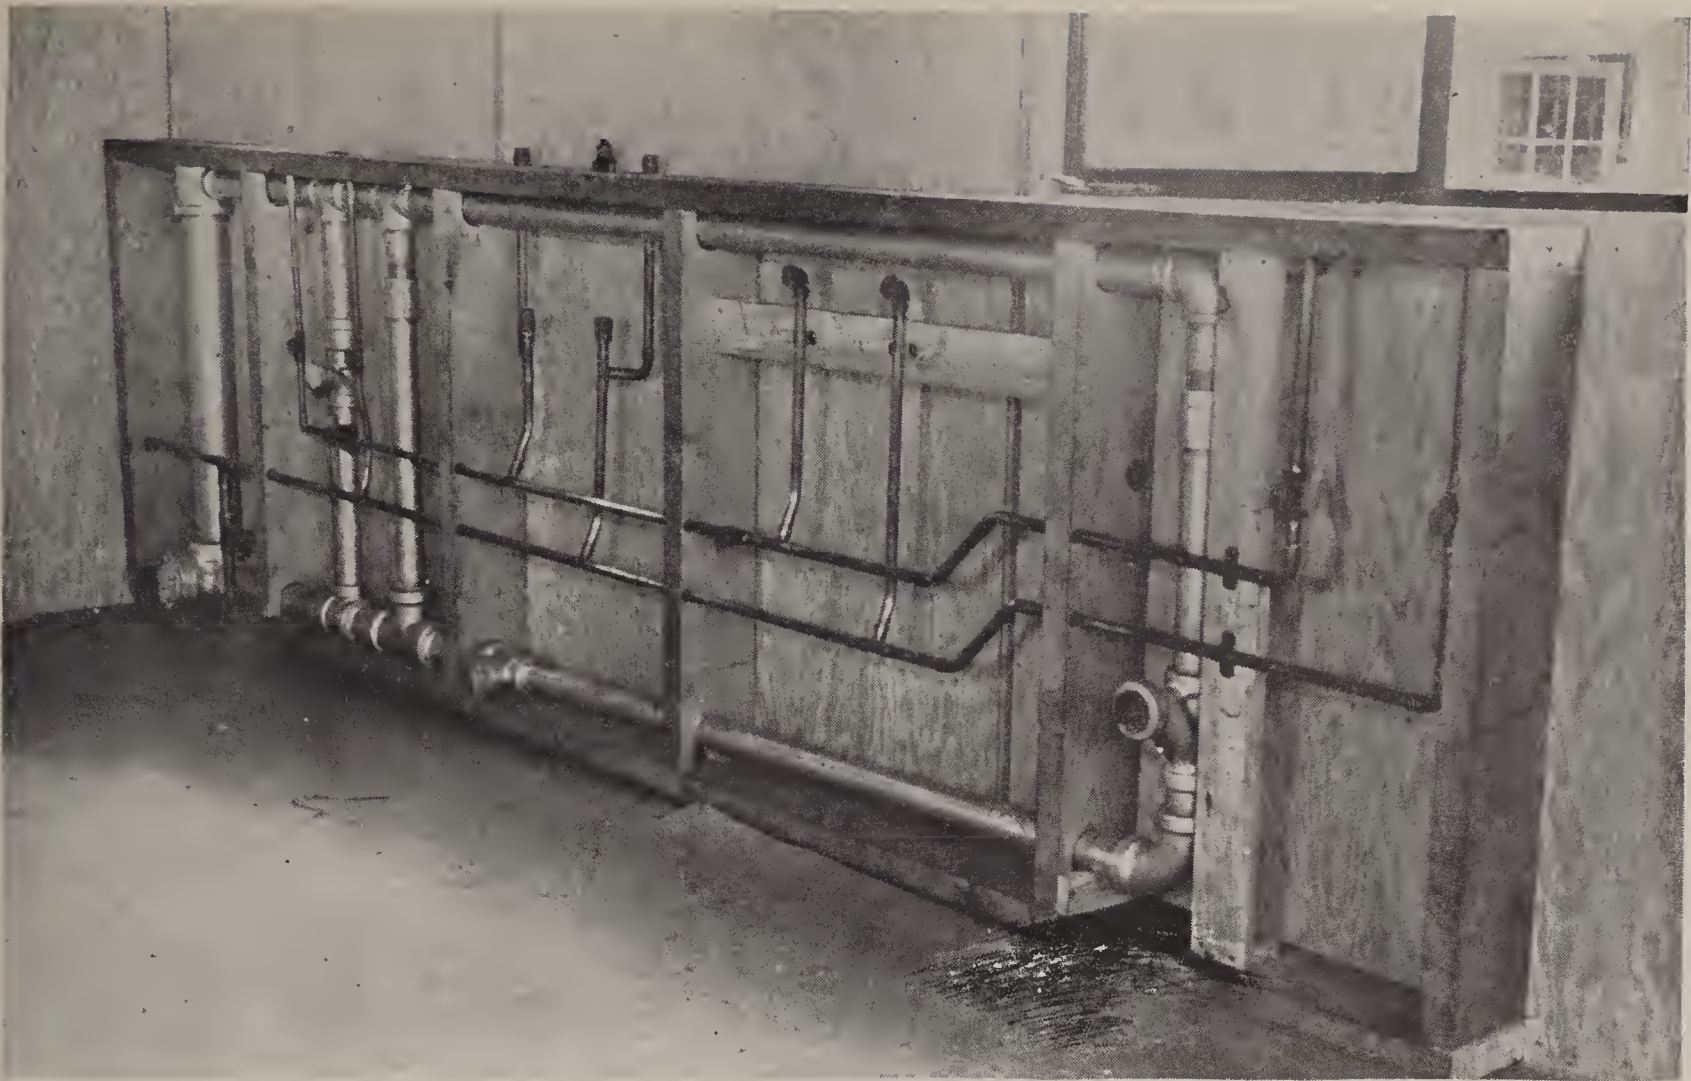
Panel unit containing piping for kitchen and bathroom plumbing.
